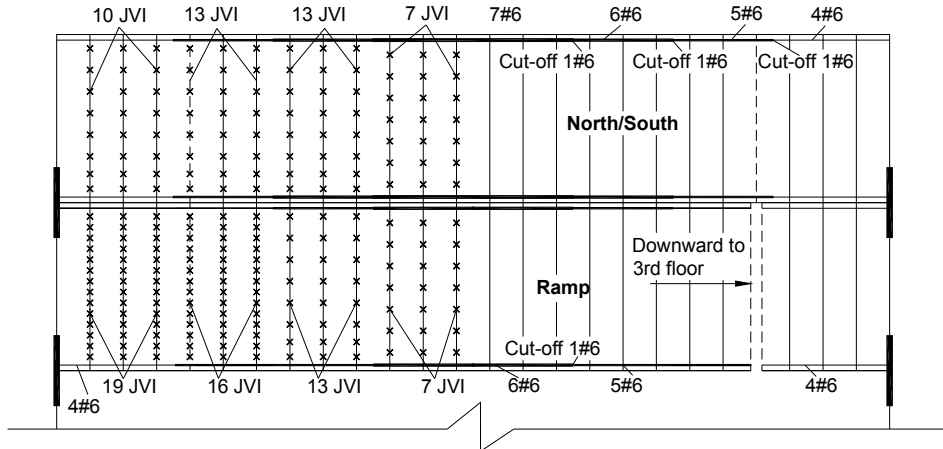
Diaphragm reinforcement at top floor for example 1B.
